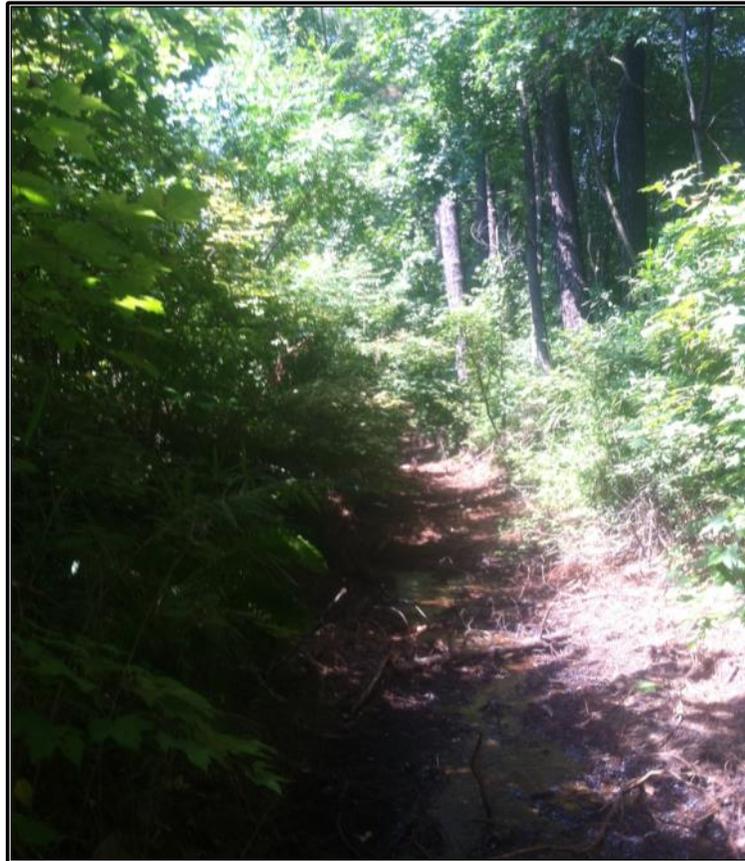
Photograph of drainage ditch at the edge of the existing ROW for I-64 in Section 2.
